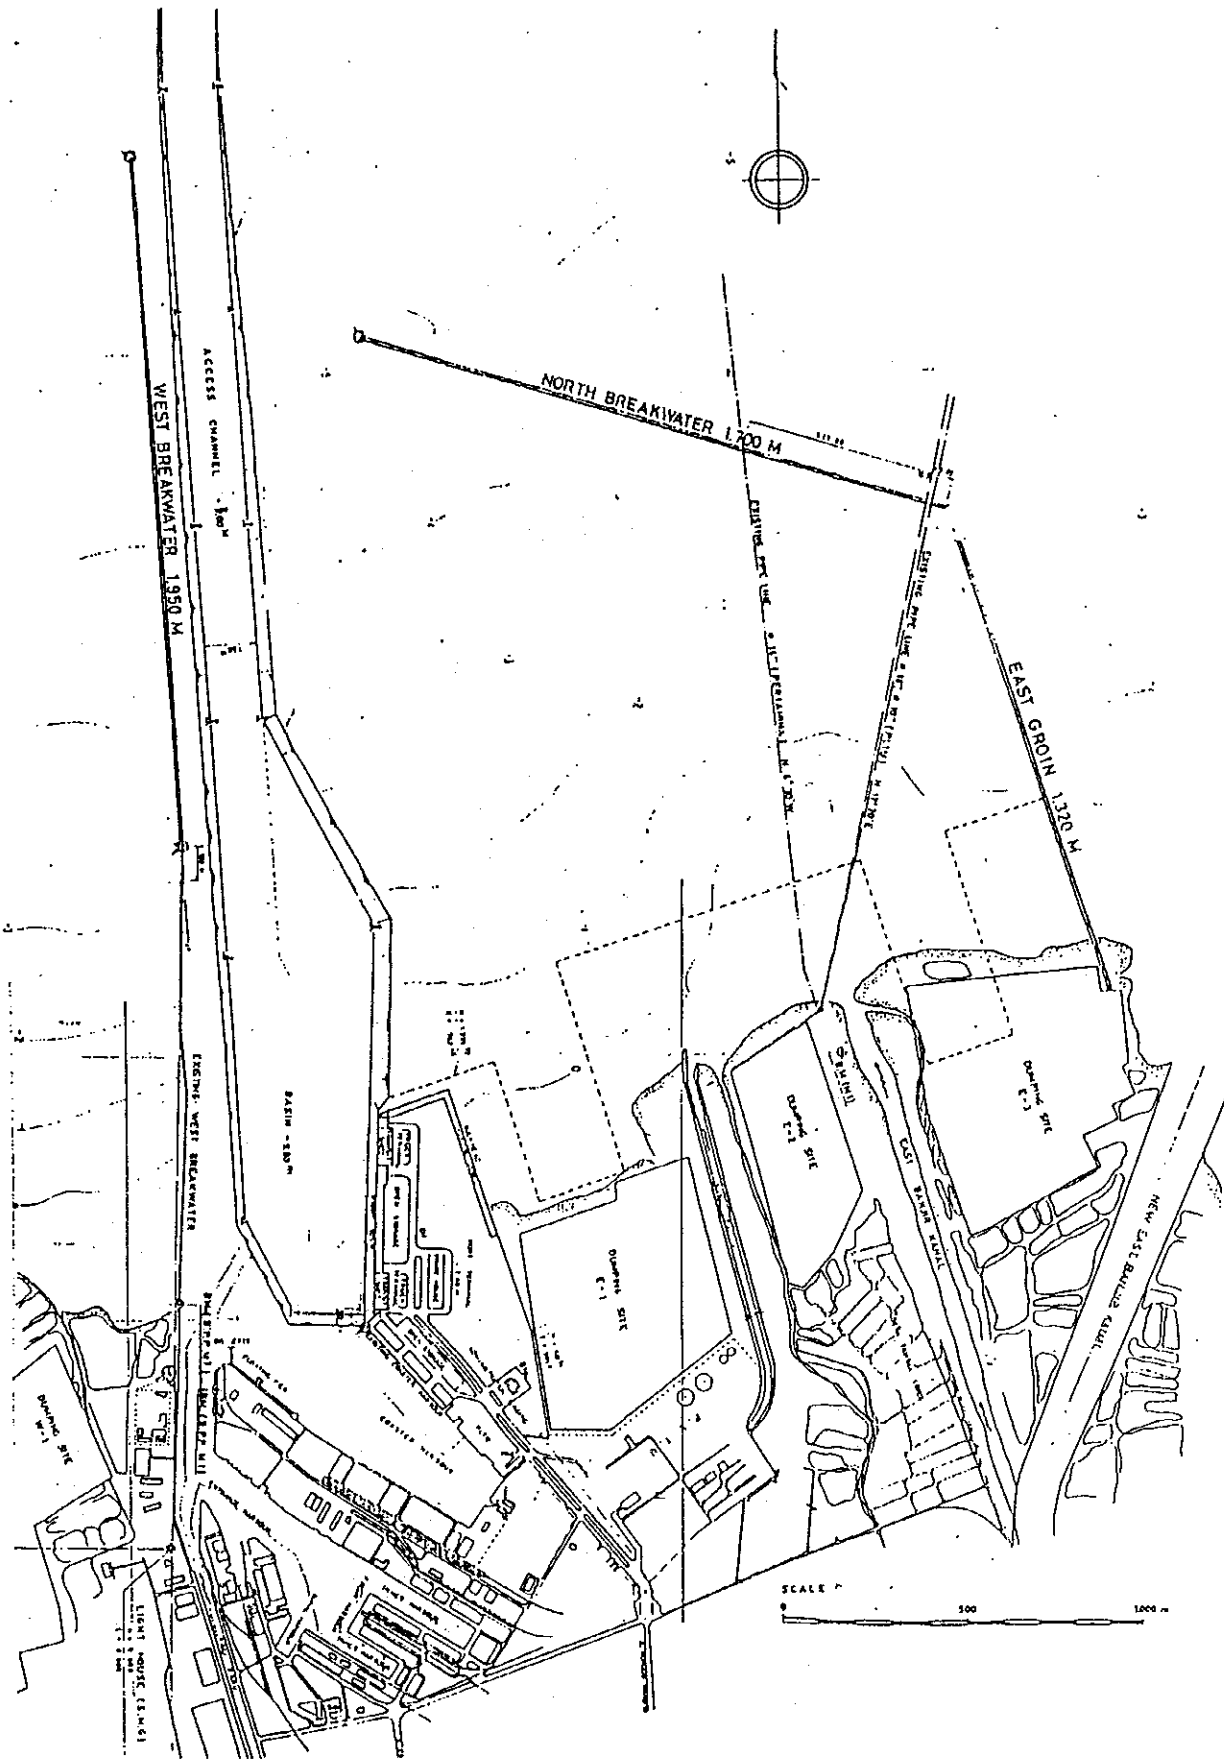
General Plan of Port of Tanjung Emas, Semarang
